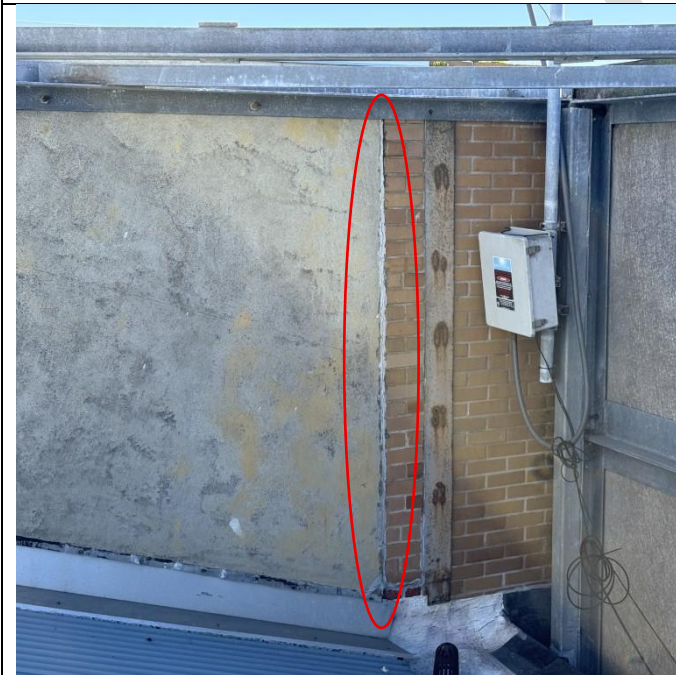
Failing sealant joint at interface with brick return wall near southeast corner
